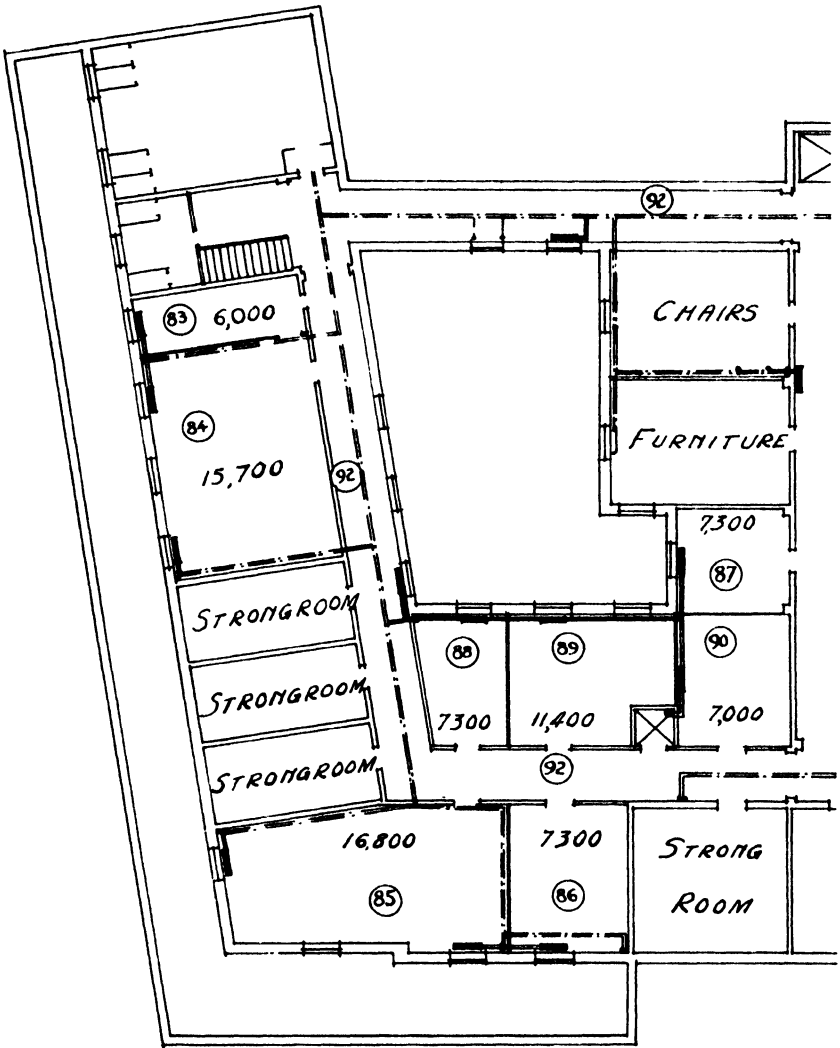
A. First-floor plan showing heating system in Town Hall building.
